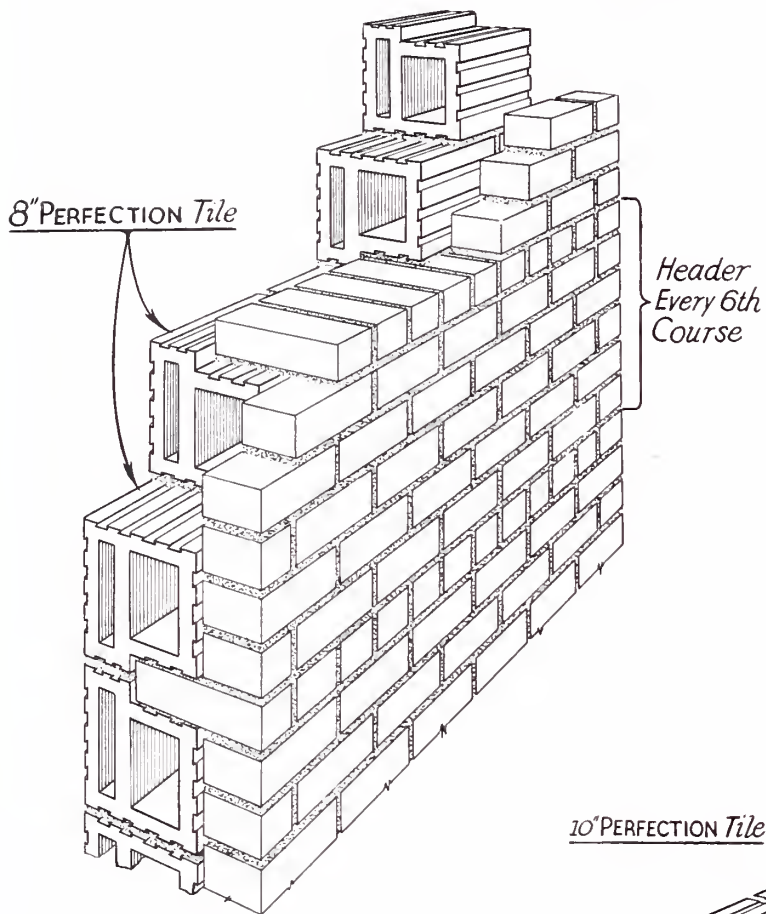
Section of twelve-inch load bearing wall with brick veneer backed with eight-inch PERFECTION BLOCK, showing method of bonding
